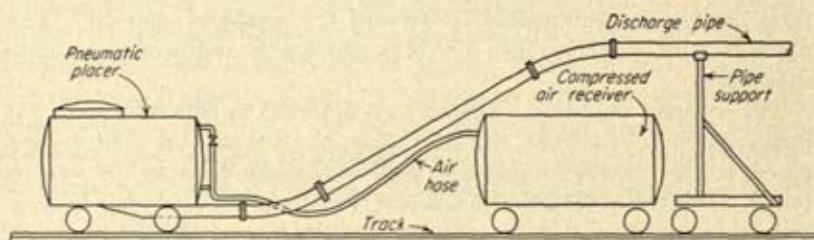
Equipment used to place concrete lining by pneumatic method.
